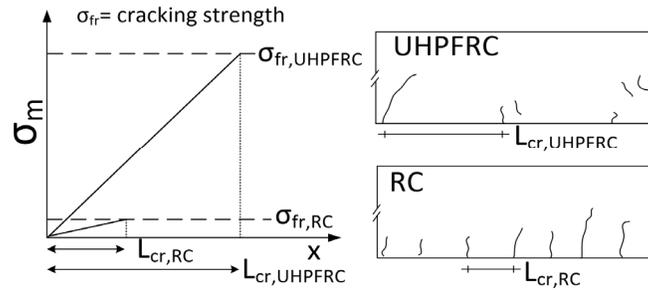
Crack spacing in RC beam and UHPC beam designed with high steel ratio
